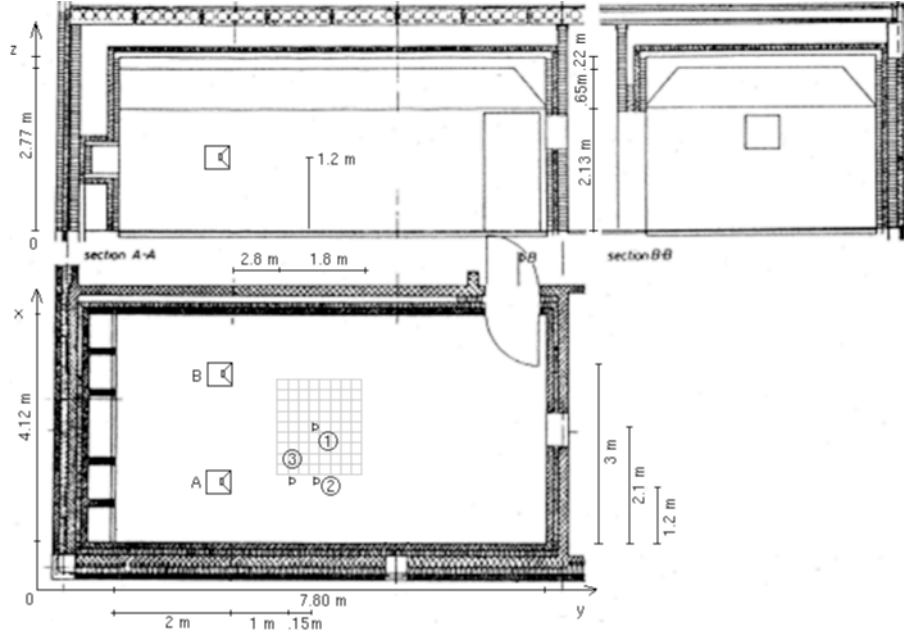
Listening test room, dimensions shape and measurement setup, adapted from [14].
